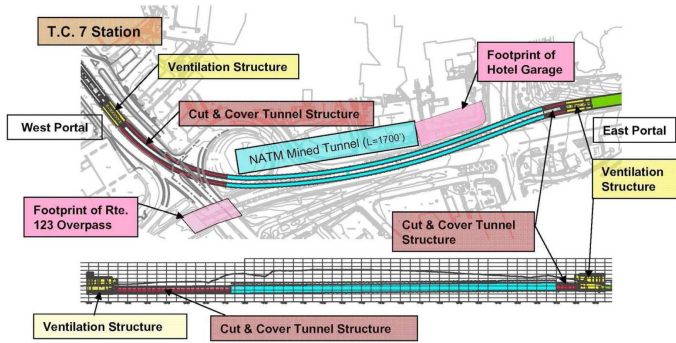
Conventional Tunnel Alignment (“NATM Mined Tunnel”)
